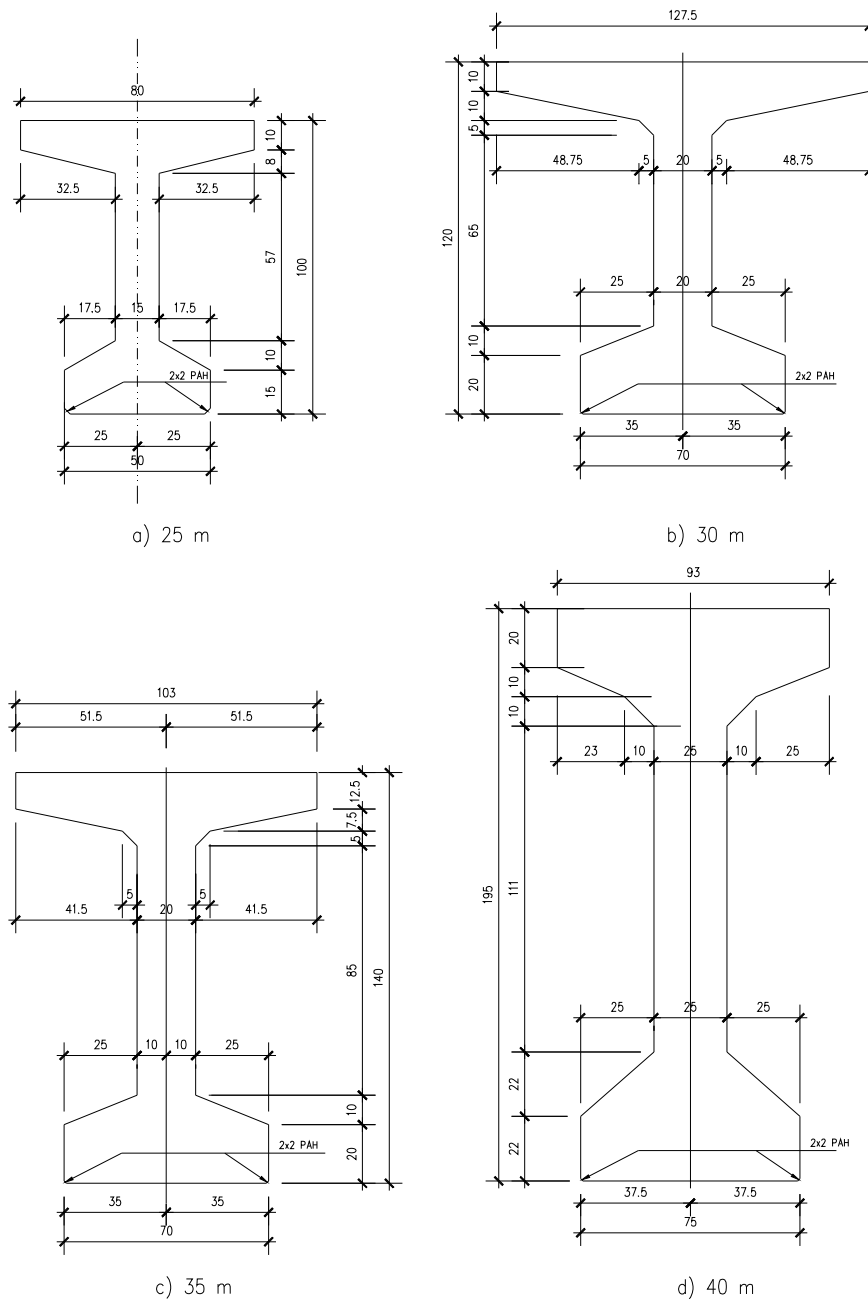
Cross-Sections of the Typical Prestressed Precast Concrete Girders
